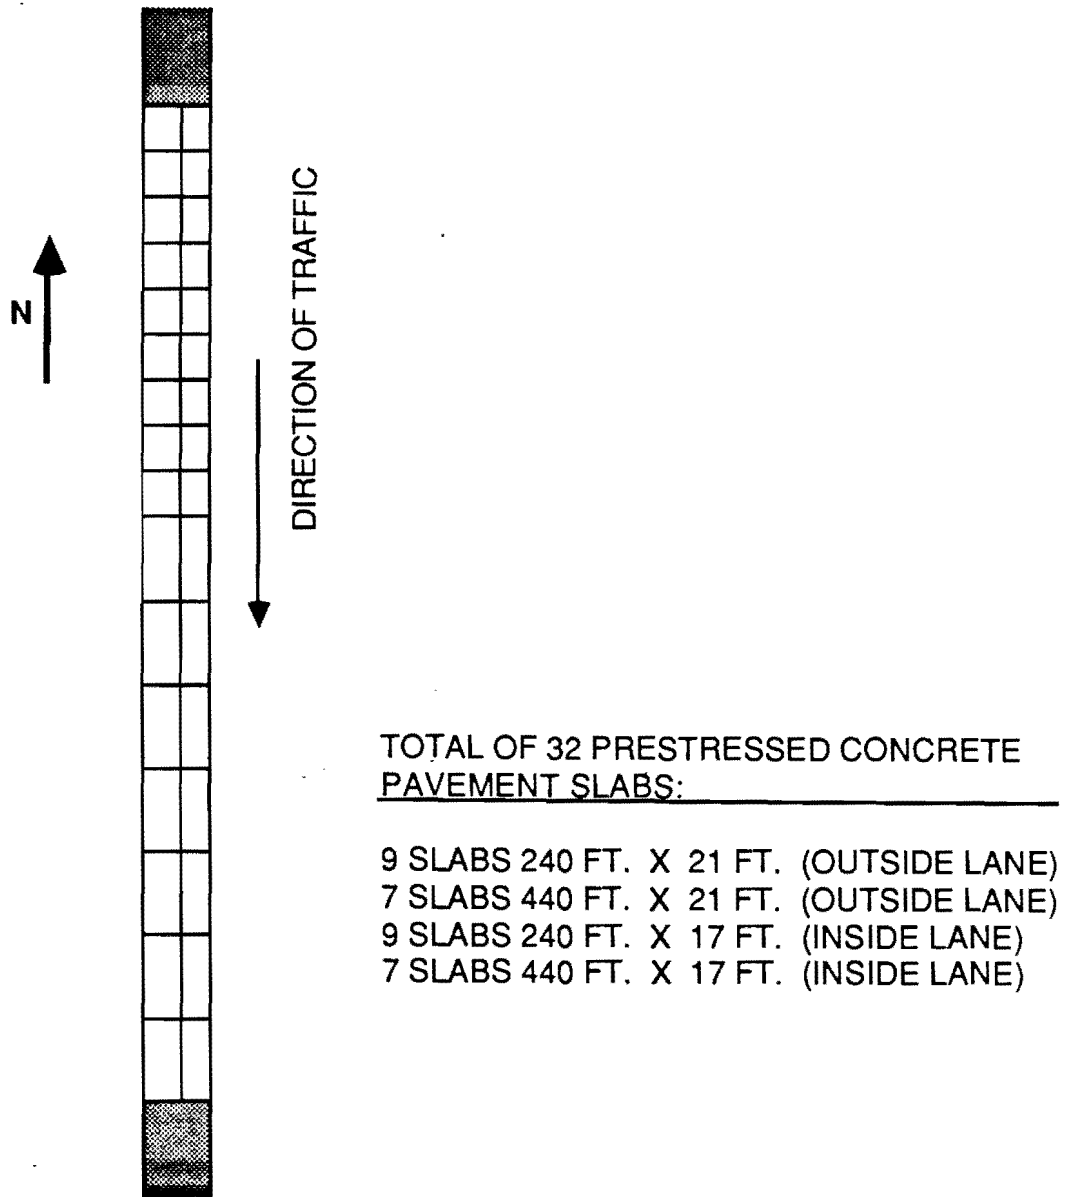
Layout of prestressed concrete pavement slabs for the Texas prestressed pavement.
